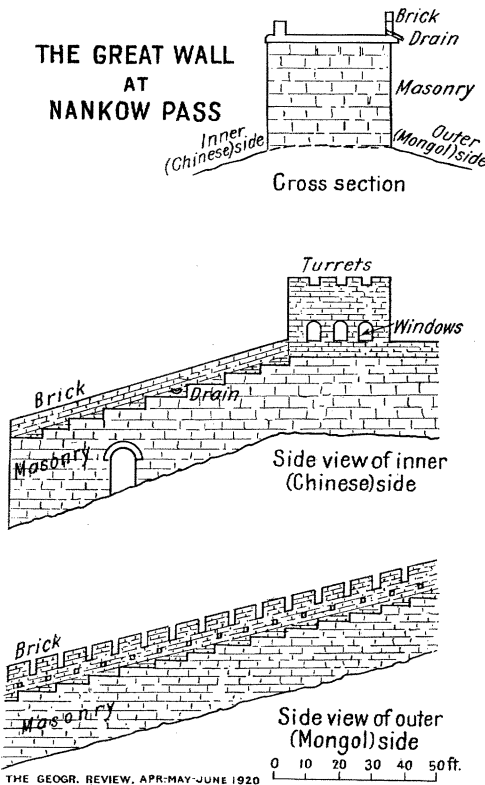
Cross section and side views of the Great Wall at Nankow Pass.
